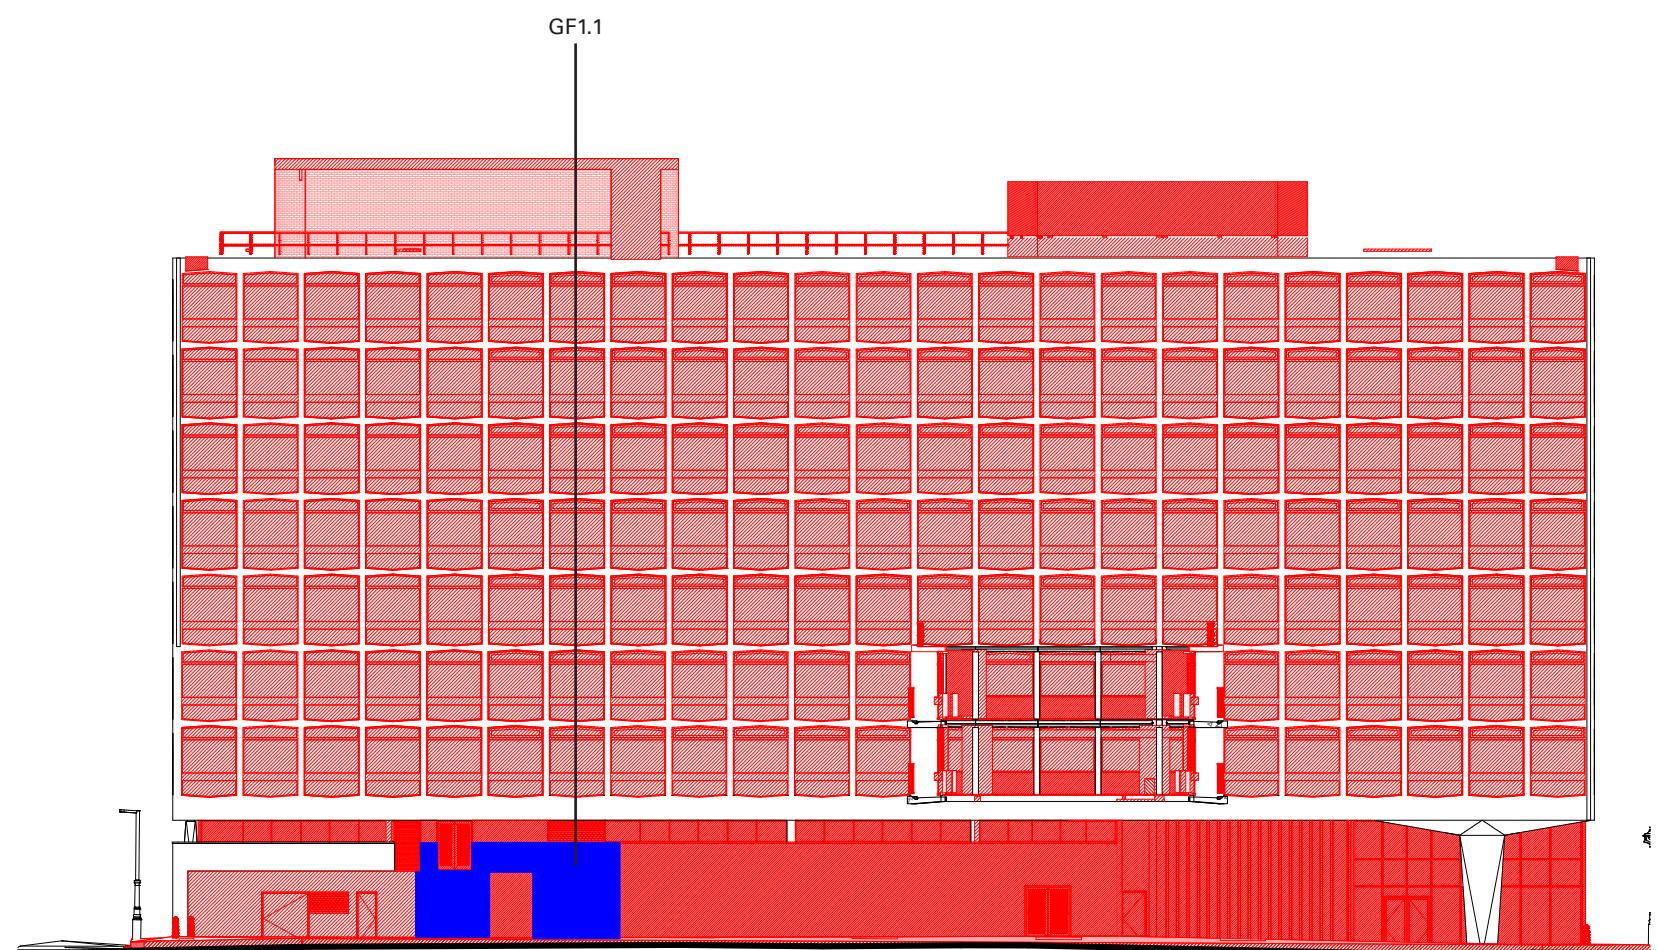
Proposed Amendments to Consented Elevation
